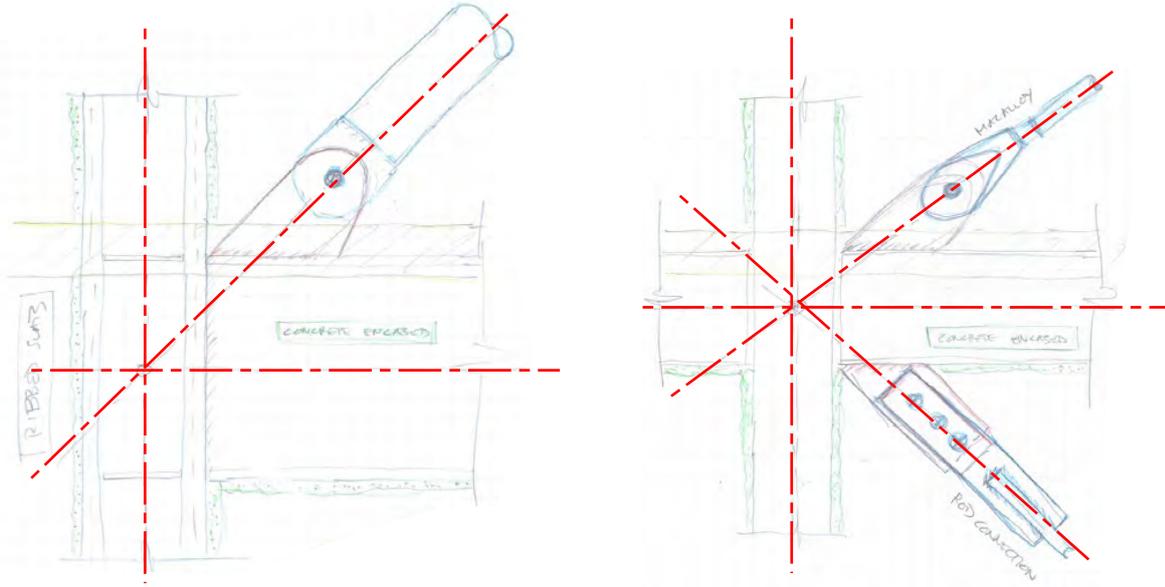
Examples of centrelines (red) of bracing, beam and column intersecting at a common node
